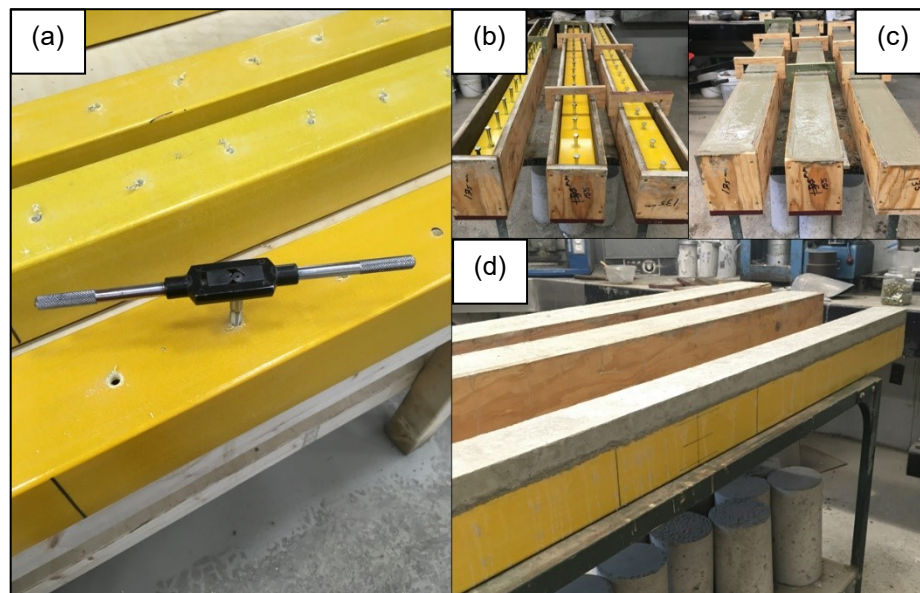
Fabrication stages of bolt bonded slab specimen: (a) tapping drilled holes, (b) specimens in formwork, (c) specimens after slabs were poured and (d) specimens after concrete cured for 24 hours
